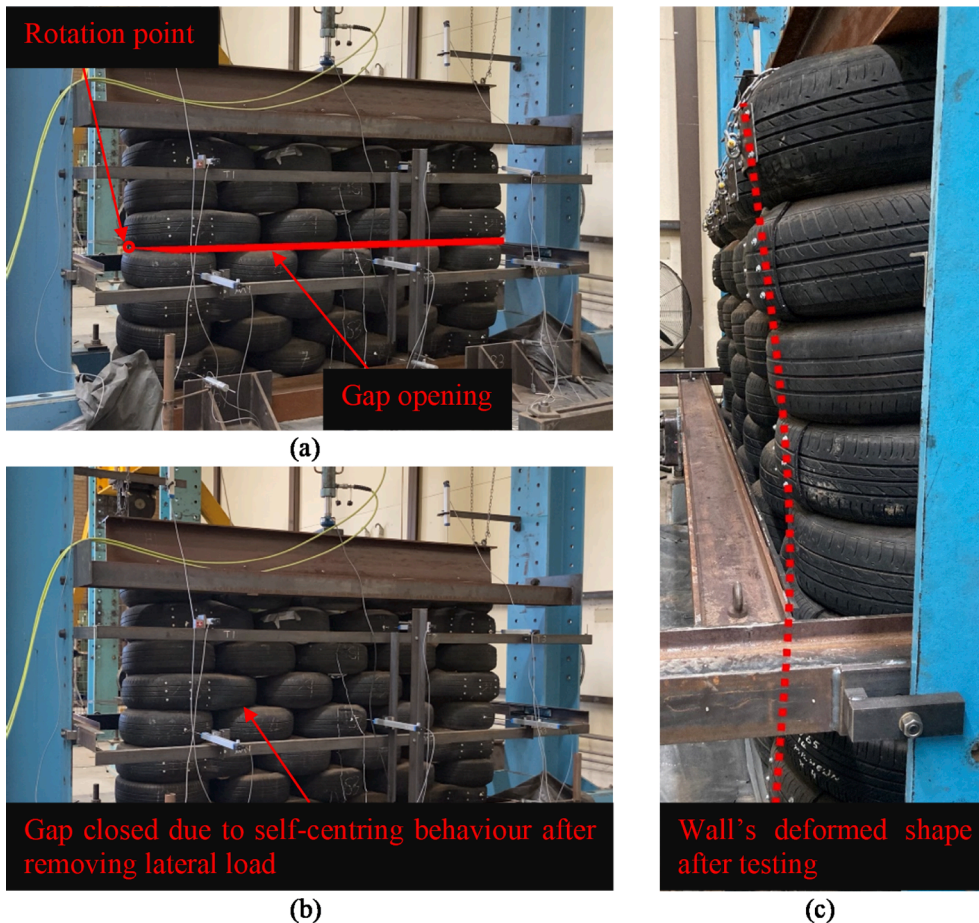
Failure behaviour: (a) opening of the tyre wall under out-of-plane load; (b) recovery of the tyre wall after removing loads; (c) Tyre wall remained bent after Stage II testing.
